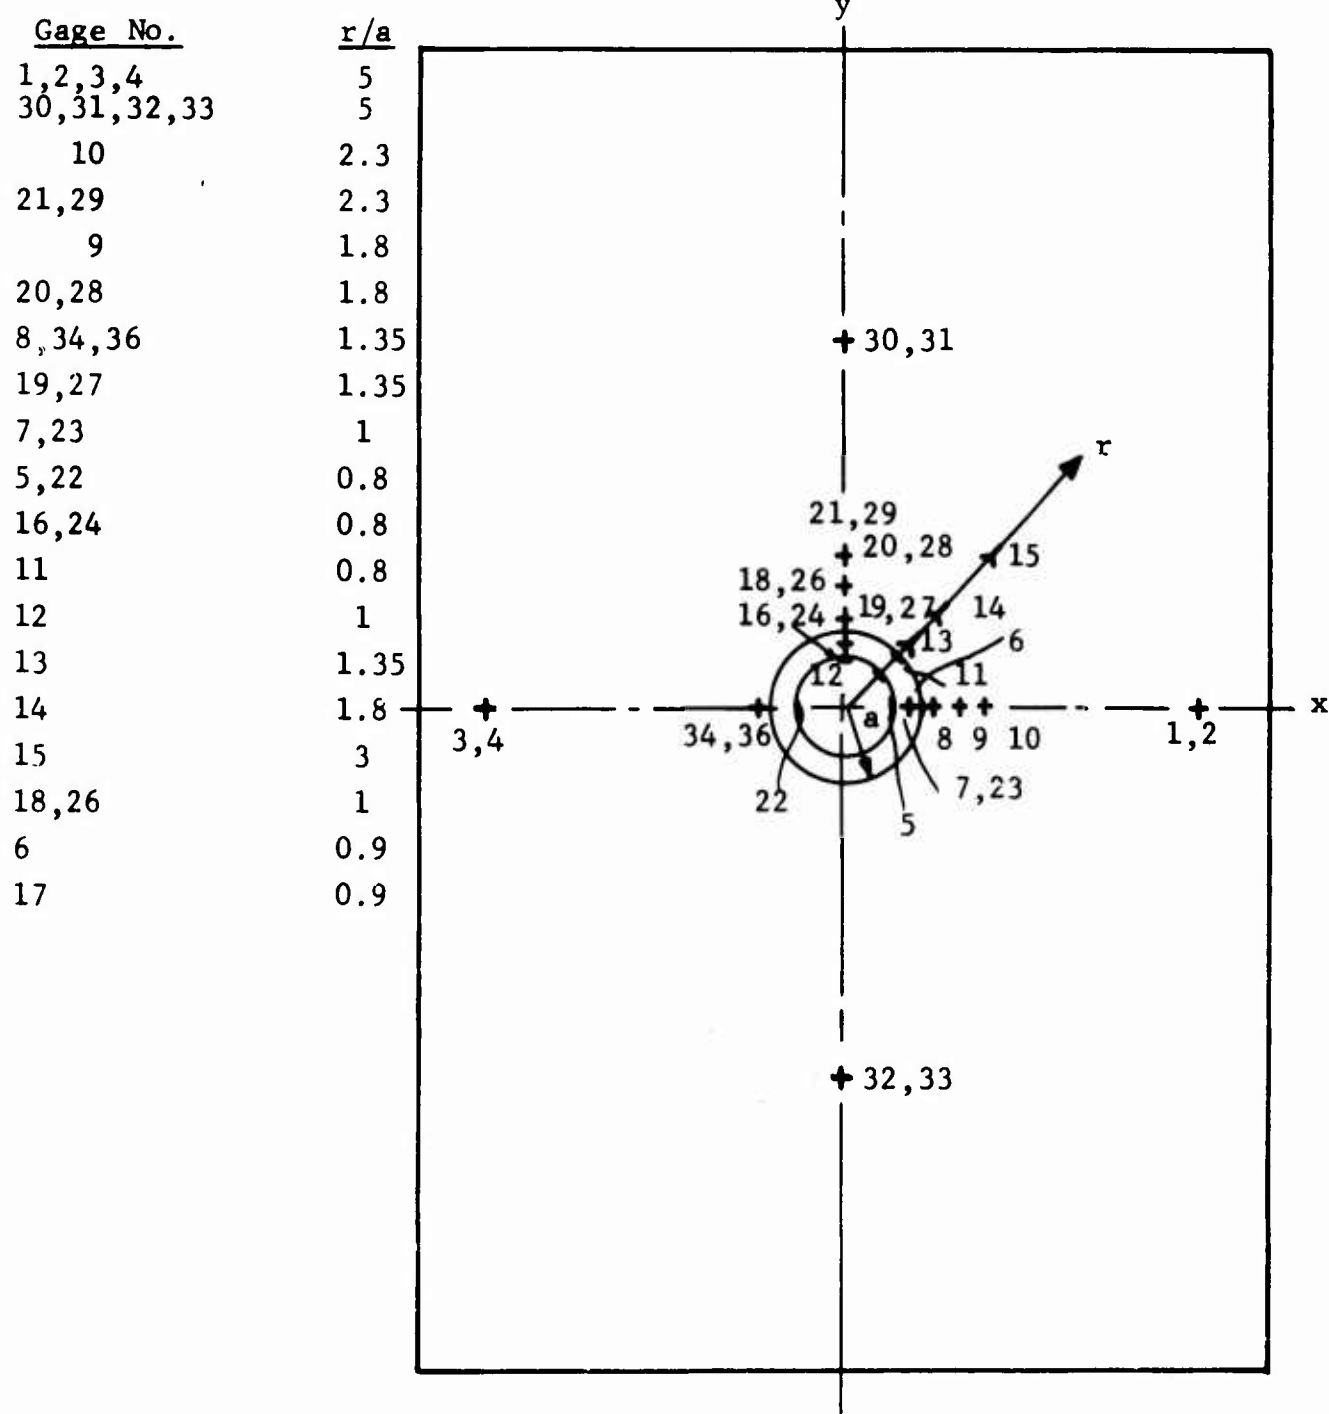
STRAIN GAGE LAYOUT FOR LIMESTONE SPECIMENS WITH HYDROSTONE LINERS
